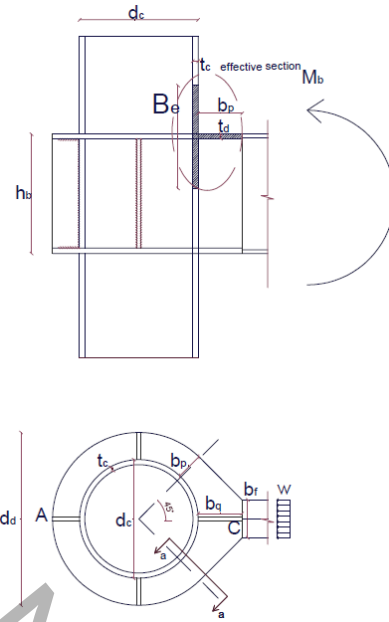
A view of I-shaped beam to cylindrical column connection [5]
